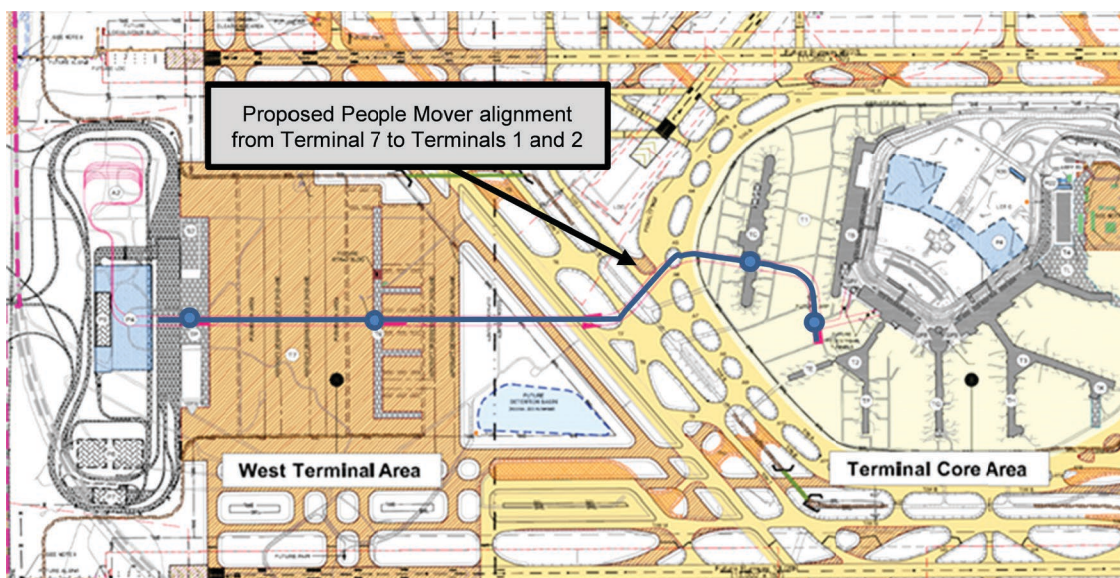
In the O'Hare Preferred Development Plan, the people-mover was to extend from the West Terminal Area to Terminals 1 and 2. Source: Chicago Department of Aviation, O'Hare International Airport Master Plan, Preferred Development Plan (Annotations and emphasis for people-mover alignment added).
